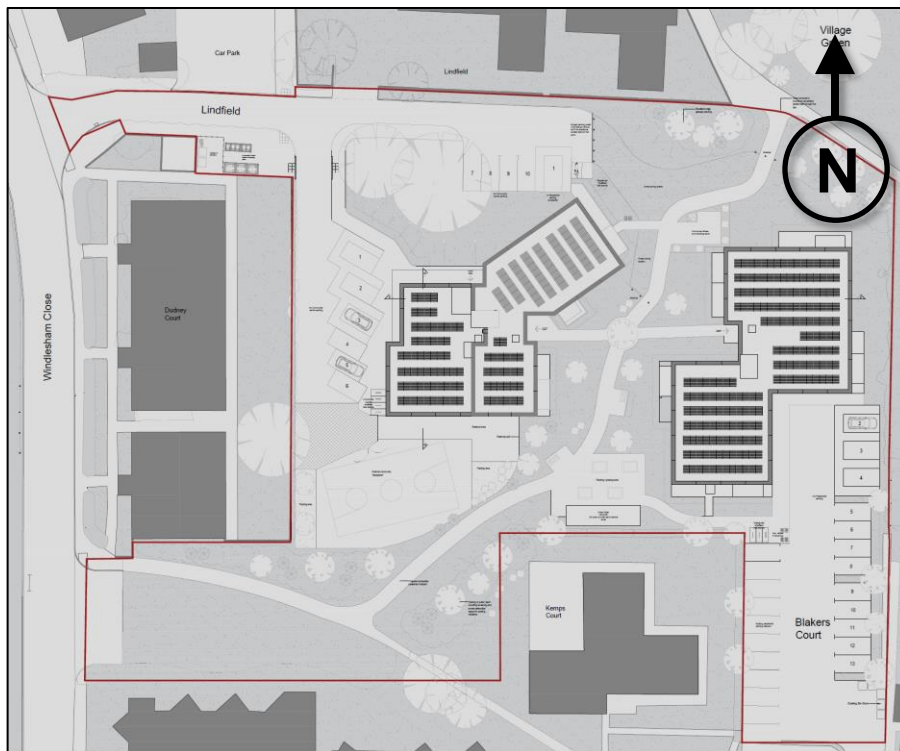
Architect's Proposed Site Layout (Miller Bourne)
